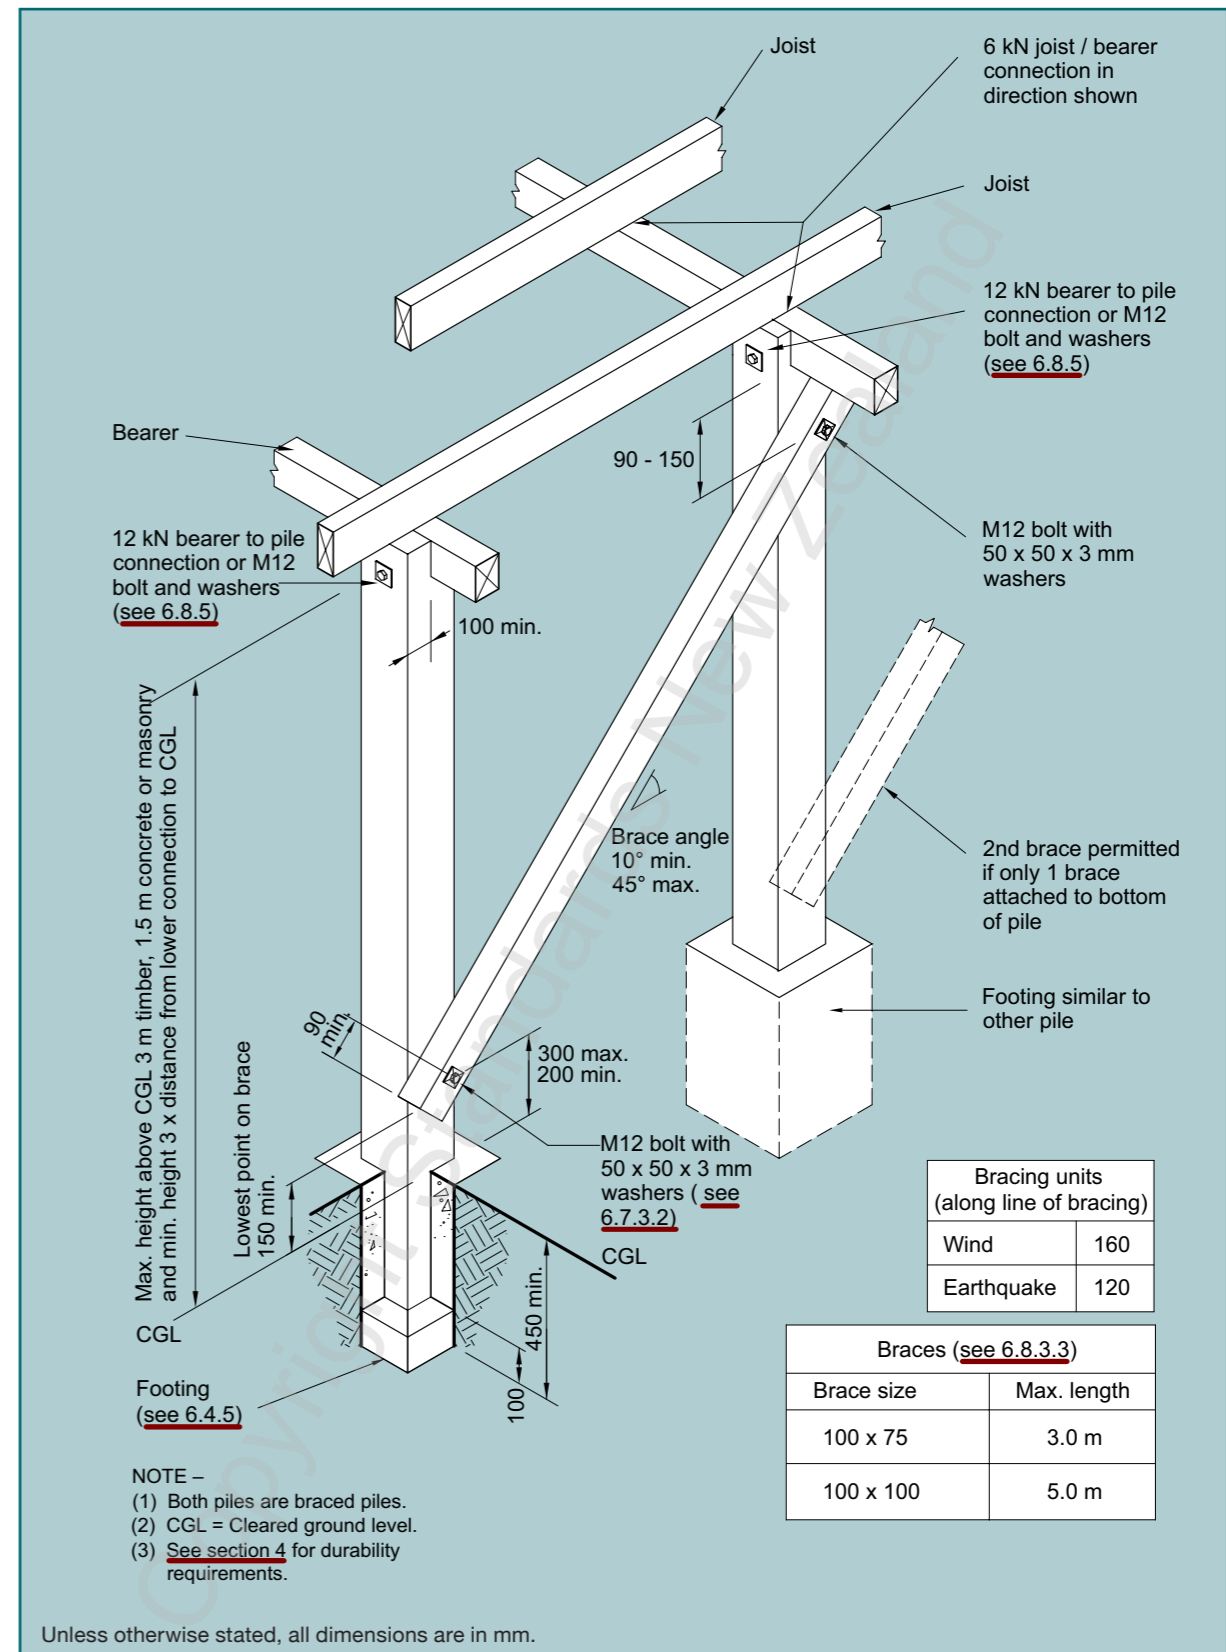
Braced pile system – Brace connected to pile (see 6.8)
